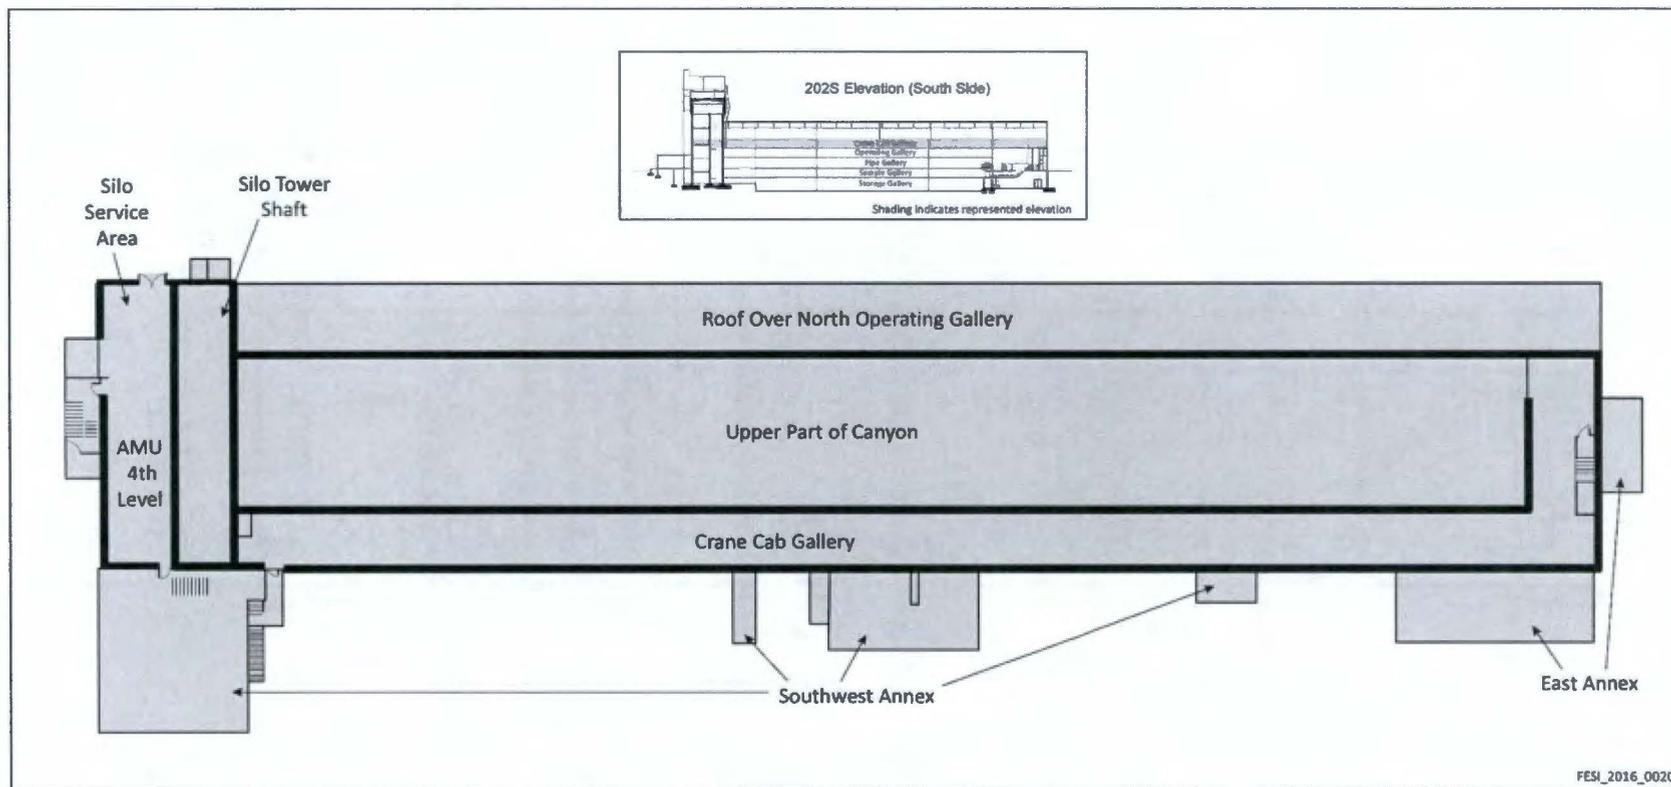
202S Building Crane Cab Gallery Floor Level
